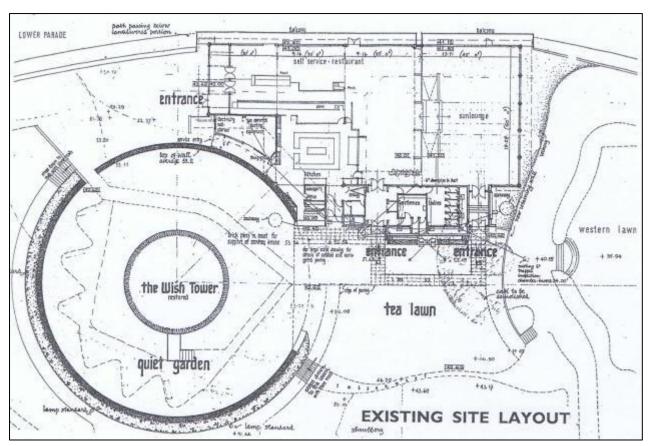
Site Plan showing Wish Tower, Counter Scarp Wall and Wishtower Café
